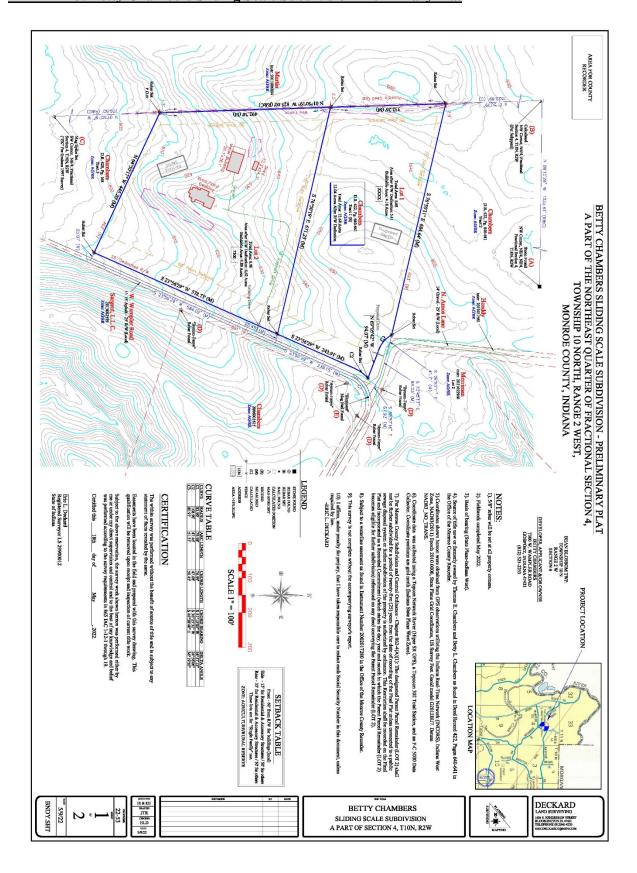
Betty Chambers Sliding Scale Subdivision Preliminary Plat
